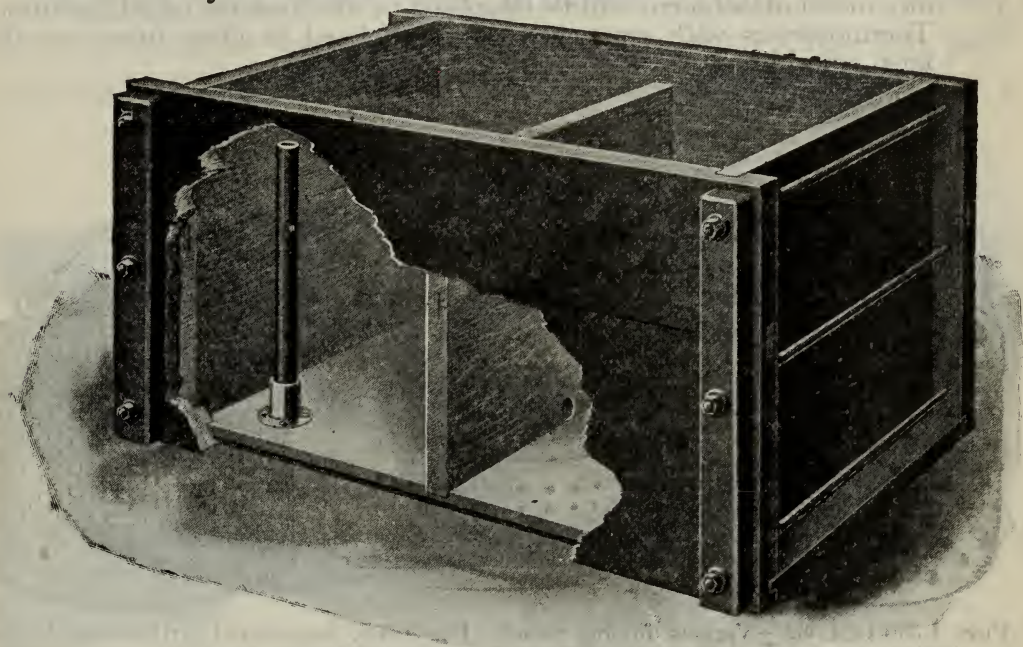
,559.—Wood tank for scouring, rinsing, and hot water. It is fitted with an overflow and outlet stand pipe made with a brass plug and taper socket. The socket should extend below the bottom of the tank, allowing for a threaded or wipe joint connection. For hot water a single compartment tank is desirable; for scouring and rinsing, a two compartment tank is generally used.
